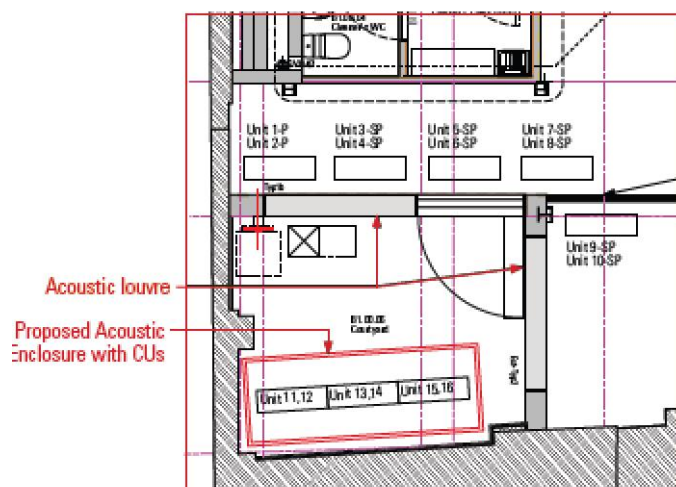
Proposed plan with location of independent acoustic enclosure
